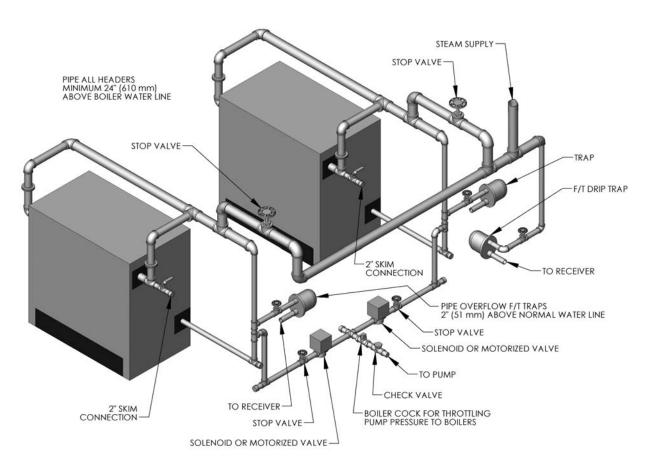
Piping Multiple Boilers, Typical, Pumped Return Systems
